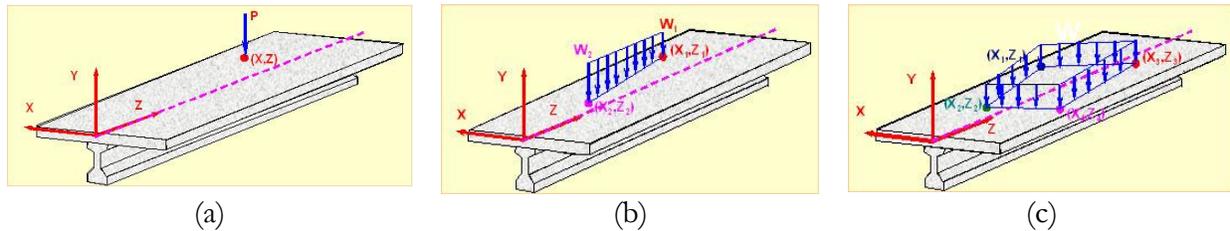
Modeling loads on decks (a) Point Load, (b) Line Load (c) Area Load
